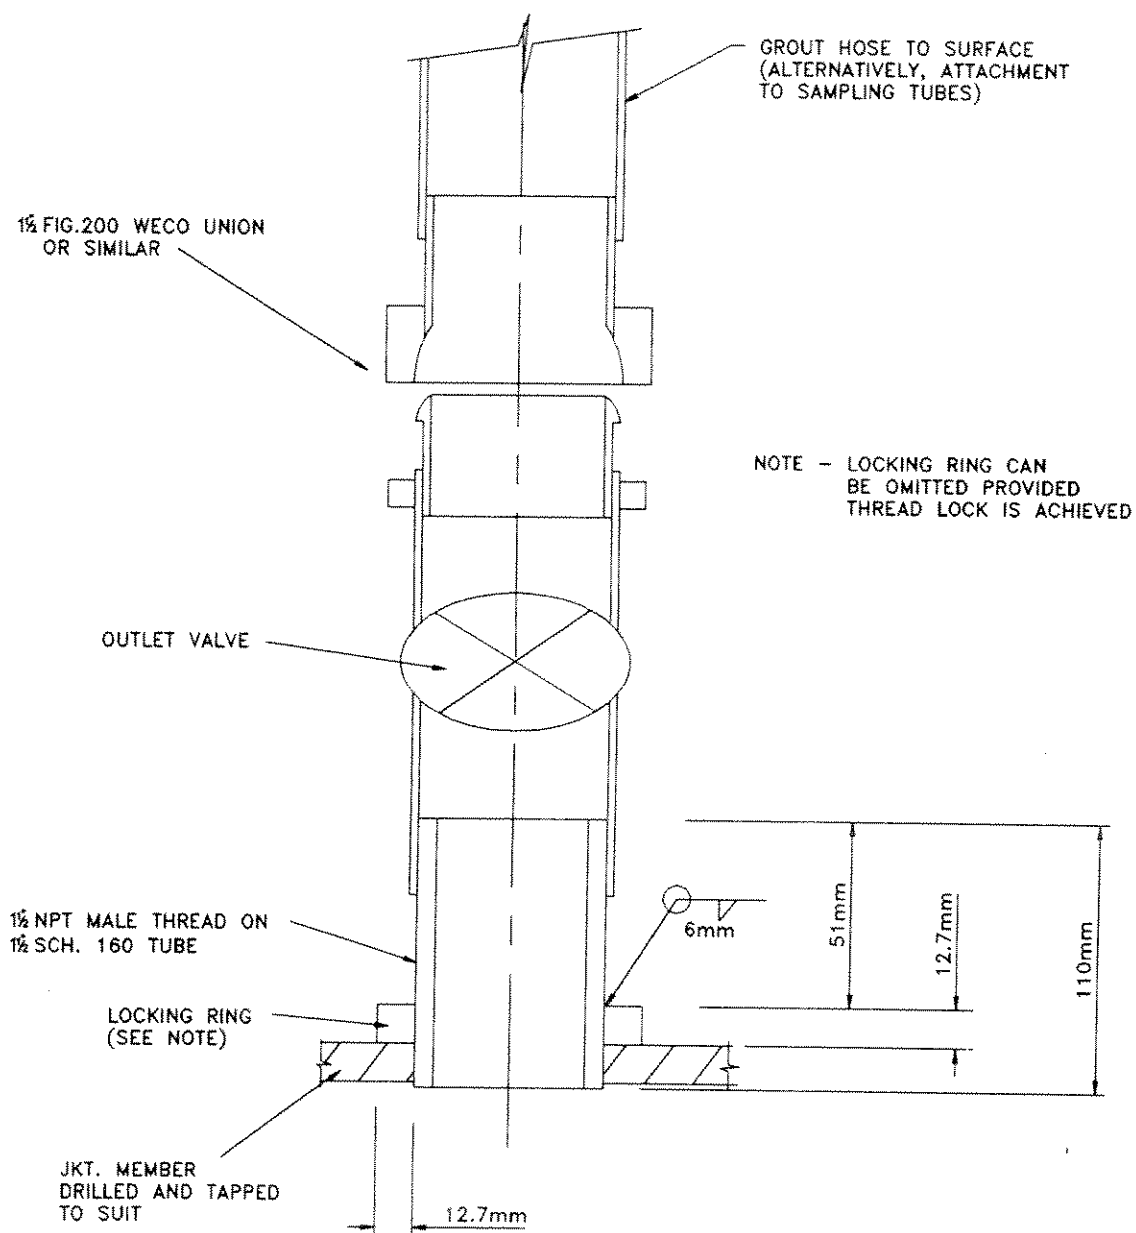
ARRANGEMENT OF GROUT OUTLET CONNECTIONS
